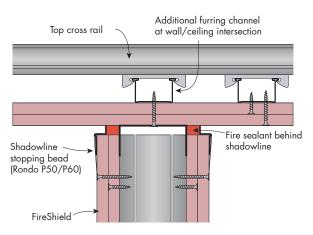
Wall Head to Suspended Ceiling Finishing Detail With shadowline
